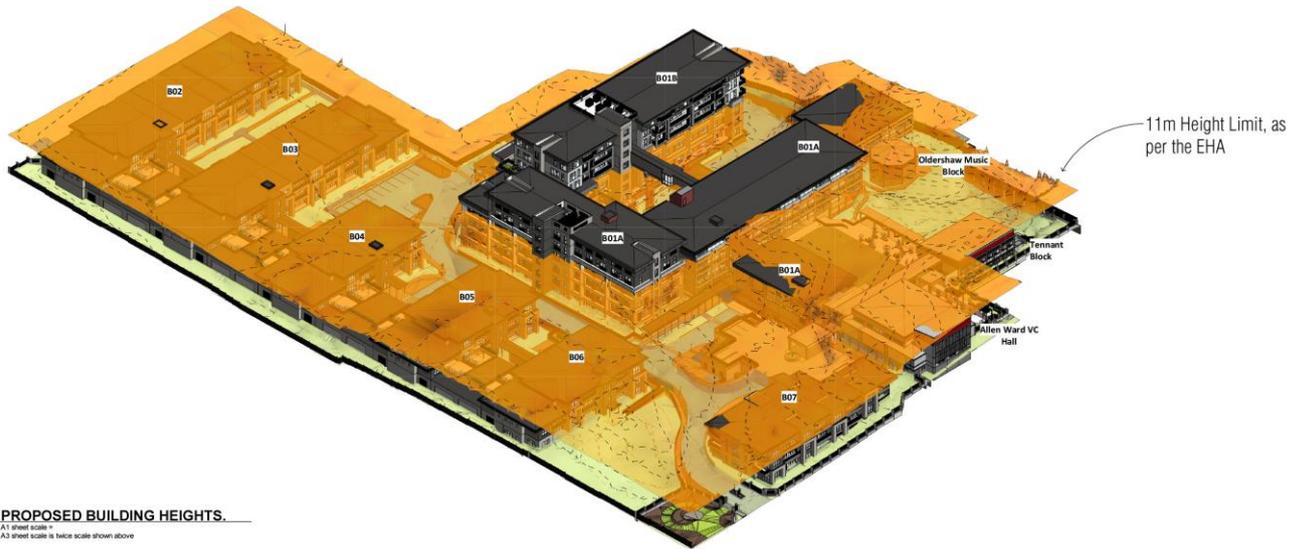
Diagram depicting Proposed Plan 11m height standard in relation to Proposed Village
